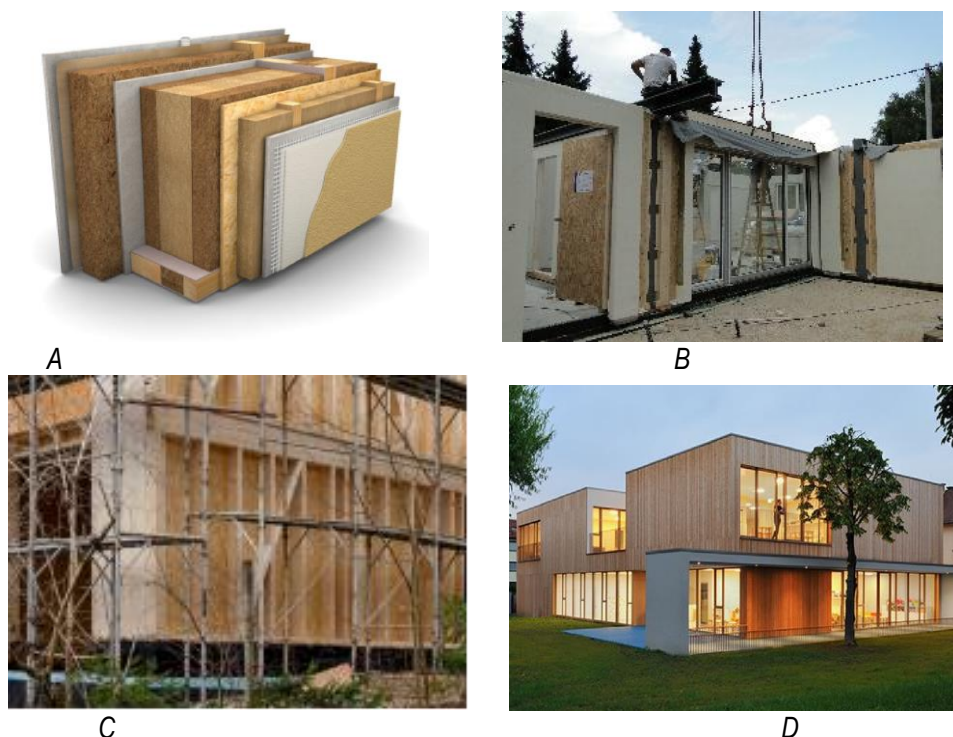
A) wall element made of wood with thermal insulation of wood fibers (Photo: Marles hiše Maribor d.o.o.); B) construction of a passive house from prefabricated elements (Photo: Lumar IG d.o.o.); C) timber post and beam construction of a passive house (Photo: Miran Kambič, Bauta d.o.o.); D) kindergarten built in passive house standard (Photo: Rihter d.o.o.)
